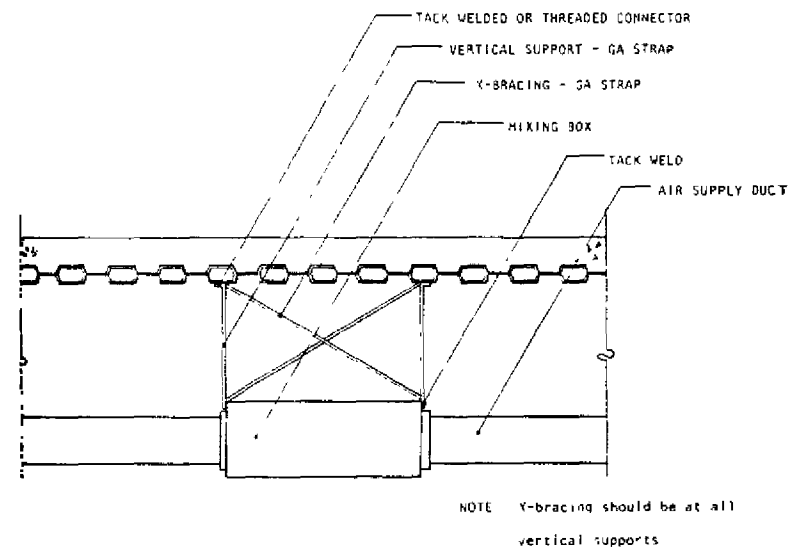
Air handling systems. Suspended lightweight mixing boxes with diagonal cross bracing
